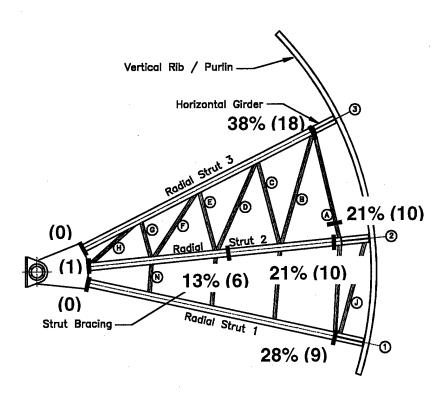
Ultrasonic Weld Test Locations and Percentage of Welds Failing Testing at Each Location.
